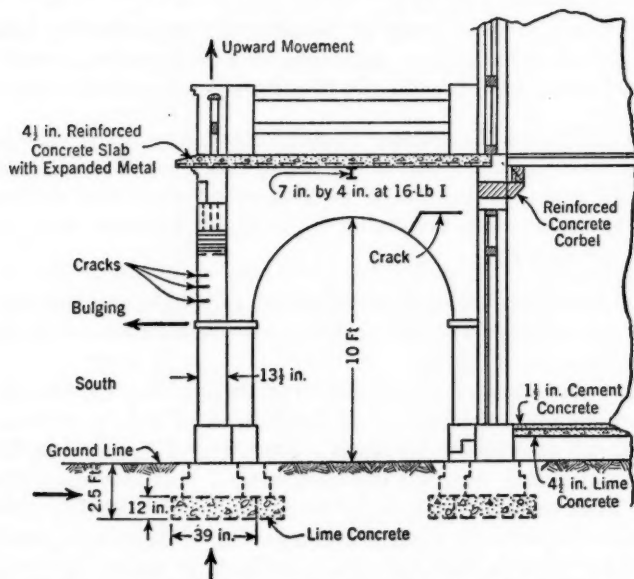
UPWARD MOVEMENT OF PORCH FOOTINGS, CIVIL SURGEON'S QUARTERS, YAMETHIN, BURMA against no appreciable resistance, although it may be due in part to some downward movement of the posts. An example of a reinforced-concrete tie beam, connecting two pile tops falling under the same forces, is described in
